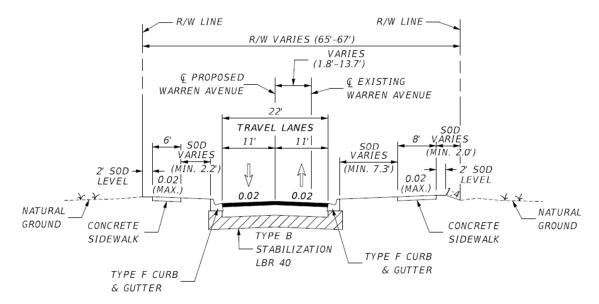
Alternative 2 Typical Section from St Laurent St to 385 ft East of St Laurent St
